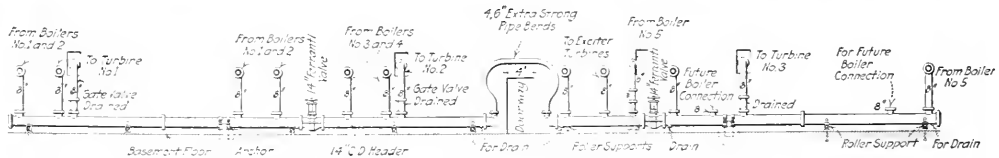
ELEVATION OF STEAM HEADER, LOOKING WEST
